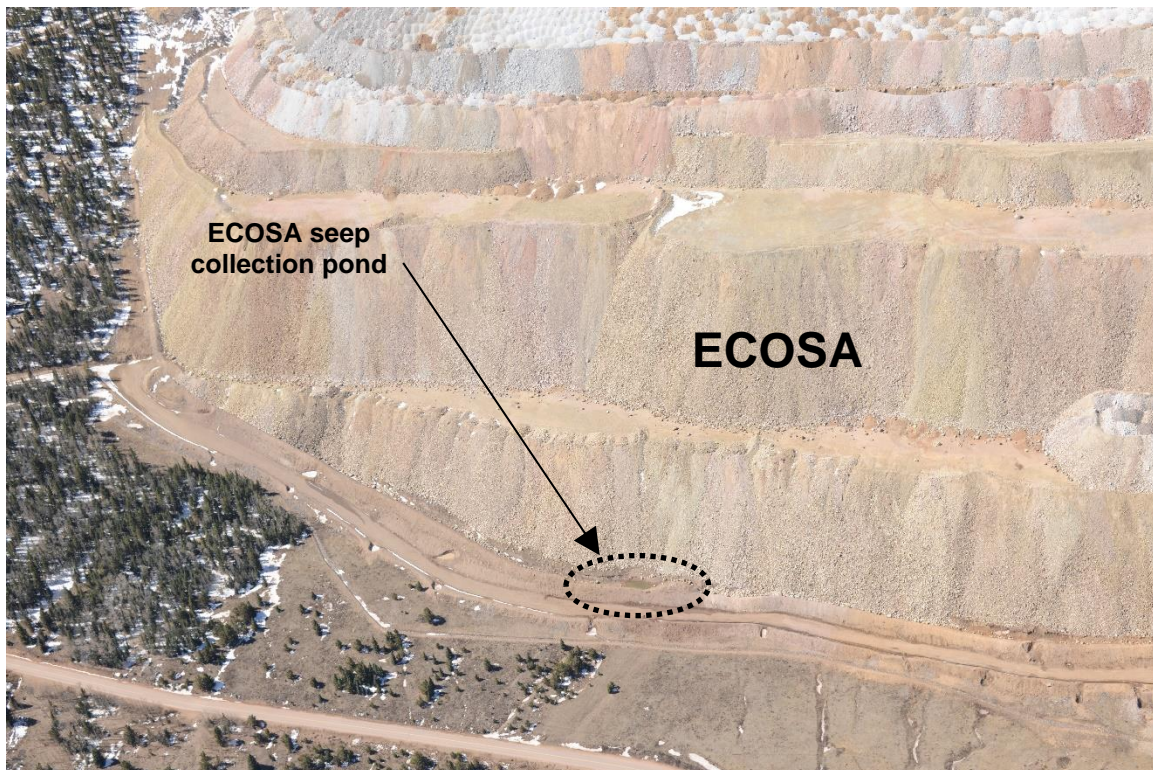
ECOSA – note water in seep collection pond (SE Toe, looking west).
